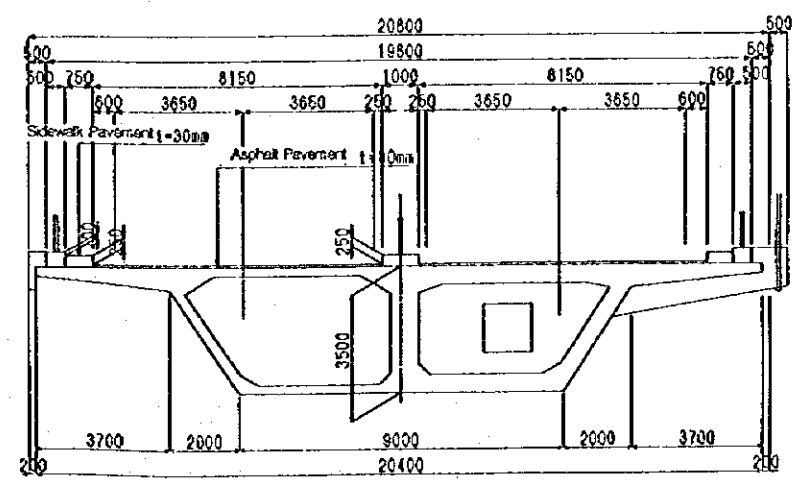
General View (Prestressed Concrete Girder Alternative : L=360m)
